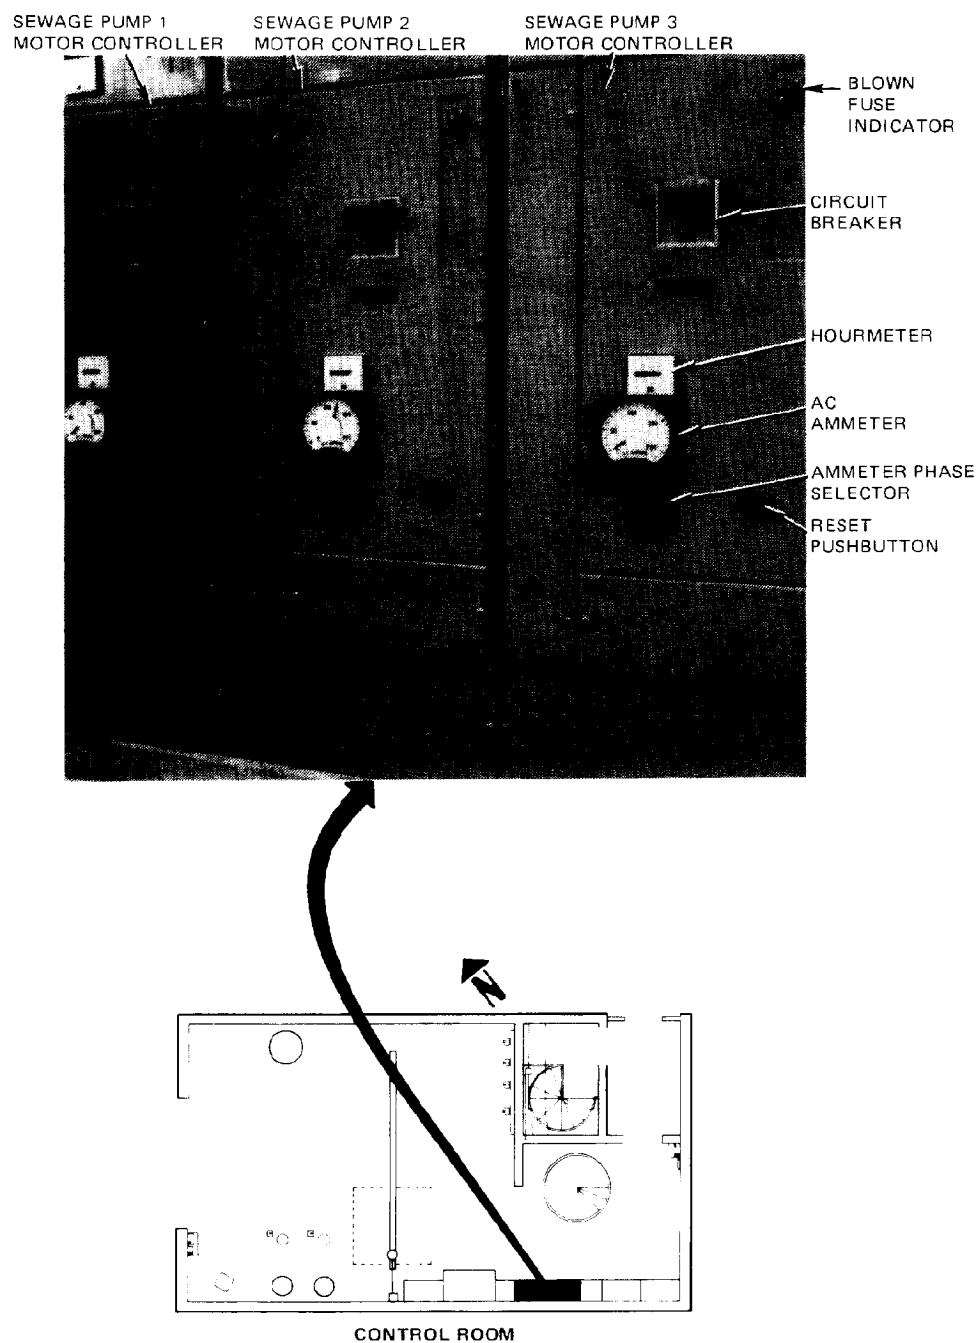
Raw Sewage Pumping System Equipment (Sheet 5 of 5)
